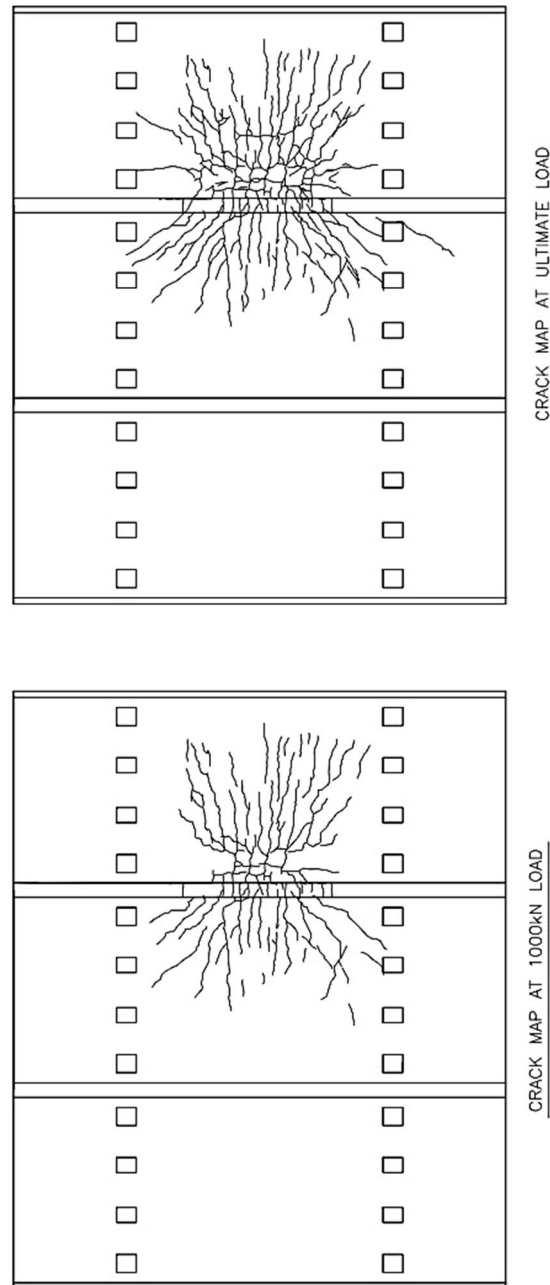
Crack Progression from 900 kN to Failure (Test #4)
